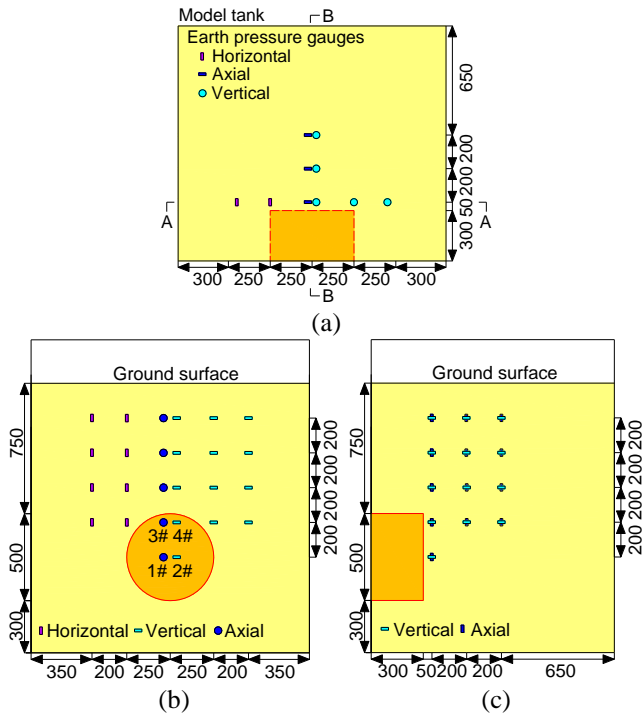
(a) Layout diagram of earth pressure gauge (unit: mm), (b) A-A section and (c) B-B section
